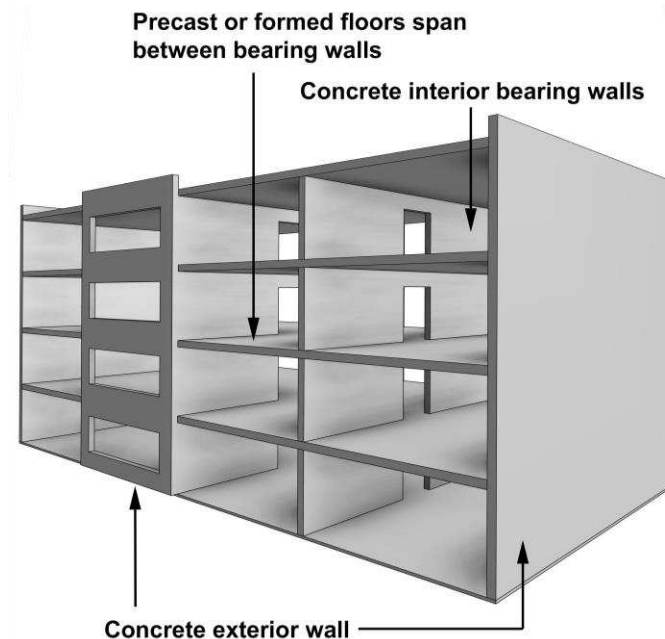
Schematic illustration of a CSW building (Figure adapted from FEMA 547, FEMA, 2006)
